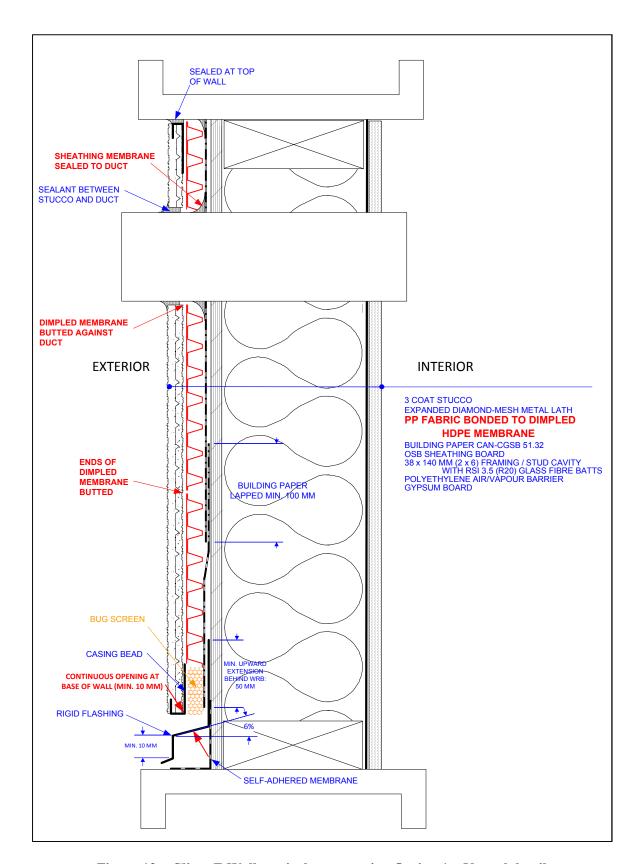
Client E Wall vertical cross section Option 1 – Vented detail
